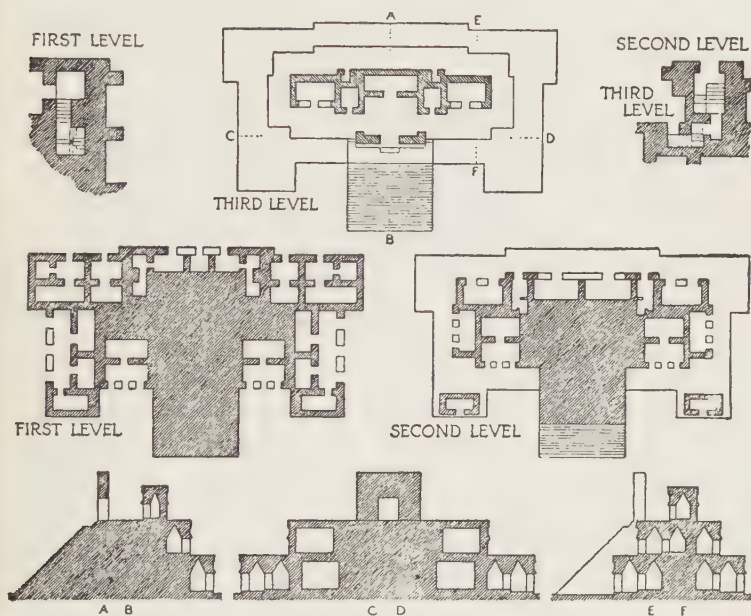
Elevations and Groundplans of the Ruin Known as Santa Rosa Xlabpak, Yucatan. Spinden, 1913. I
